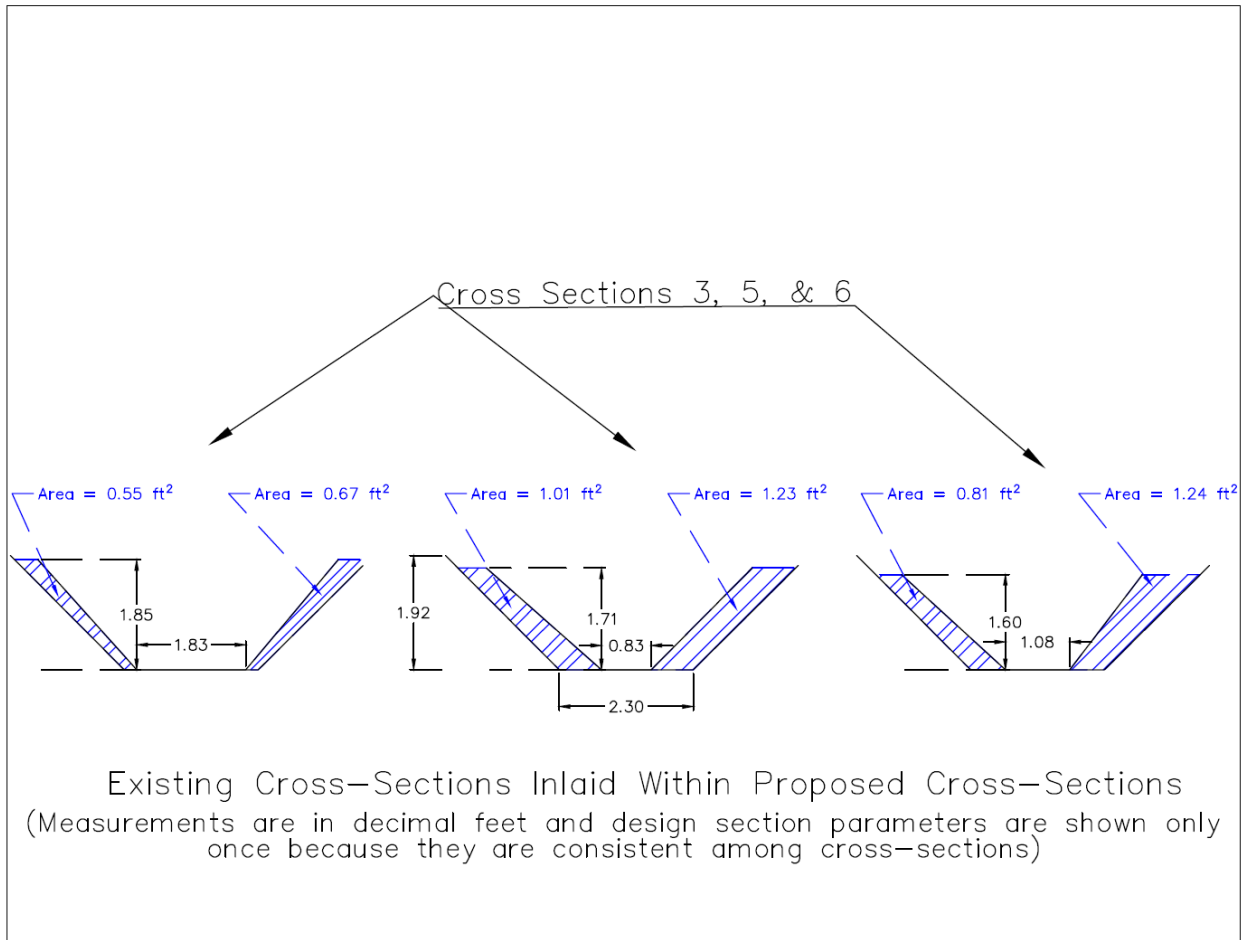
Excavation Costing Parameters, with Existing Channel Cross-Sections Superimposed within Proposed Cross-Section
